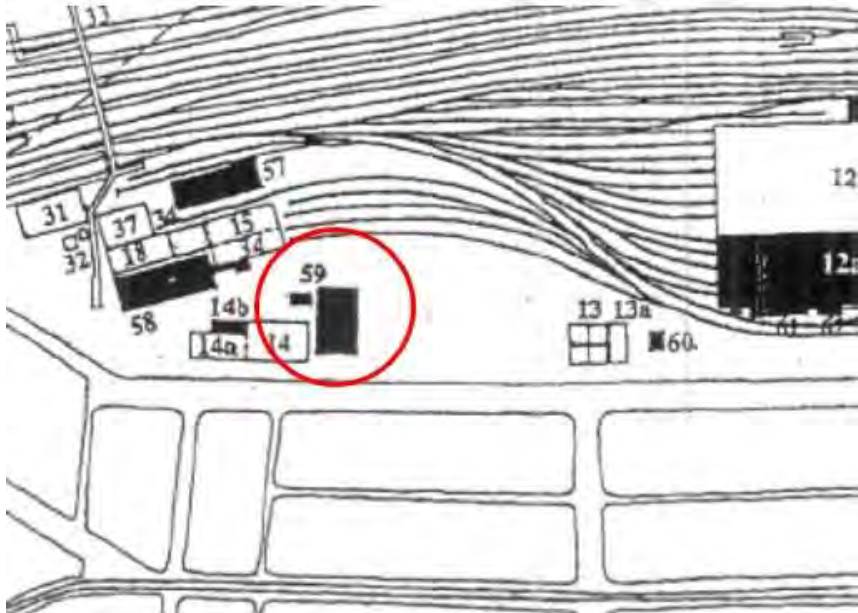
Buildings indicated on site within the North Eveleigh Paint Shop Precinct by 1927. Scientific Services Building No.1 and out house c.1916 outlined in red (Source: DPWS)
